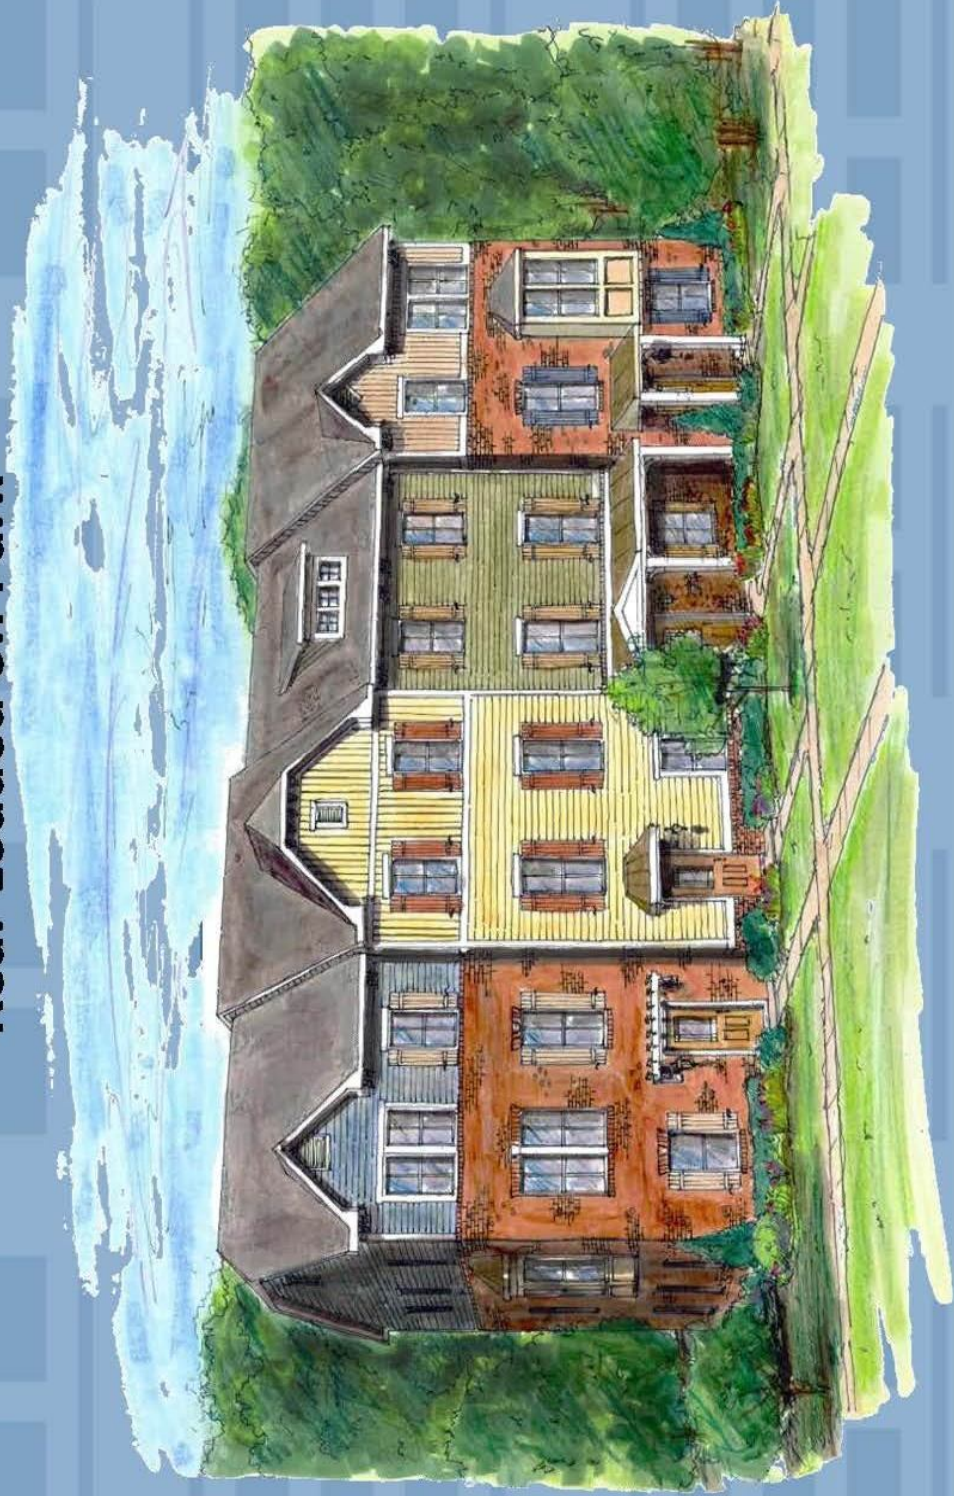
EXHIBIT B (CONCEPTUAL ELEVATIONS)
